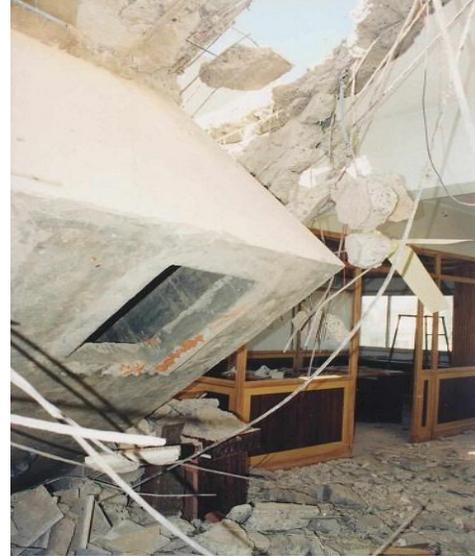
The water tank pierced through the roof and fell on the first floor, damaging the structural members of the building beyond repair.
